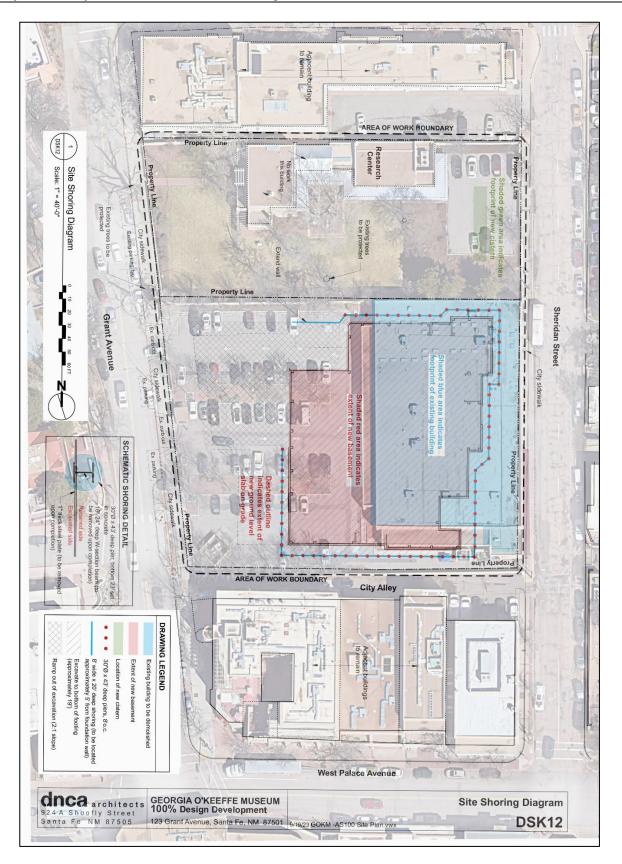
Construction Plan with Aerial of 123 and 135 Grant Ave.
